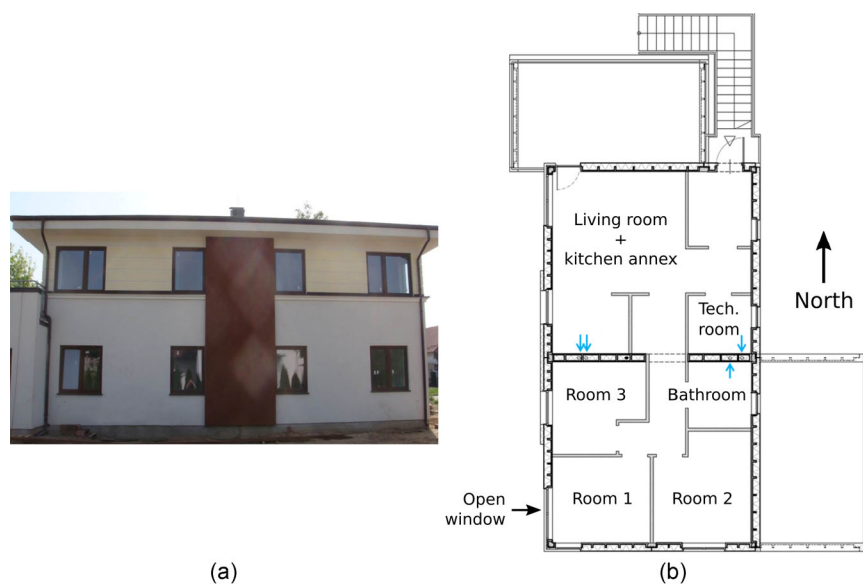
(a) West facade of test building and (b) 1st floor plan (test apartment) (chimney inlets are marked with blue arrows)
